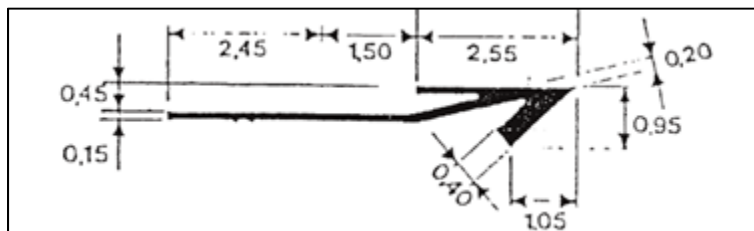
Illustration. Pavement Marking Swiss Arrow Design
